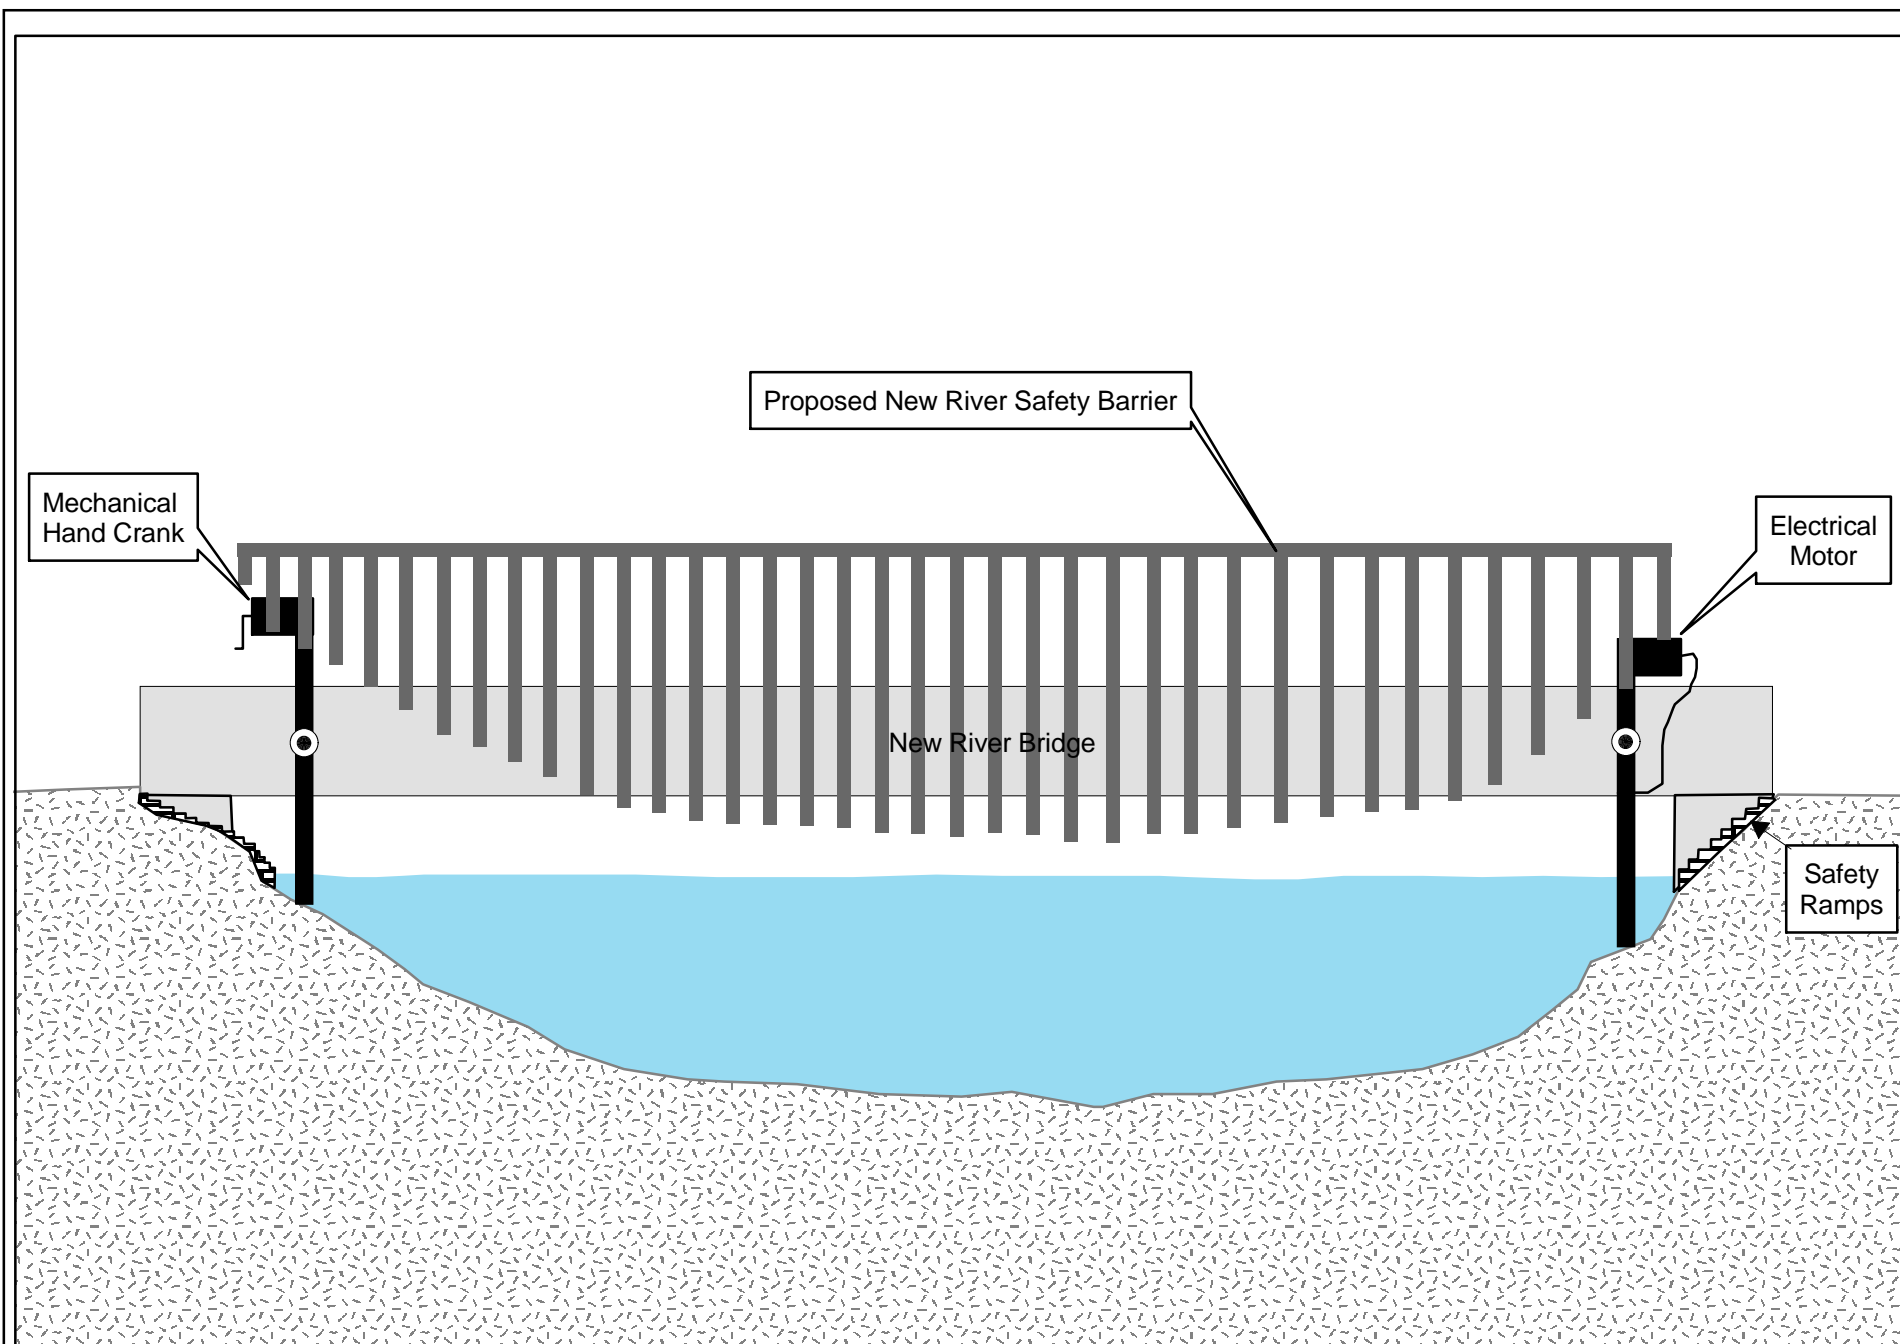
Proposed New River Safety Barrier Schematic in Raised Position
